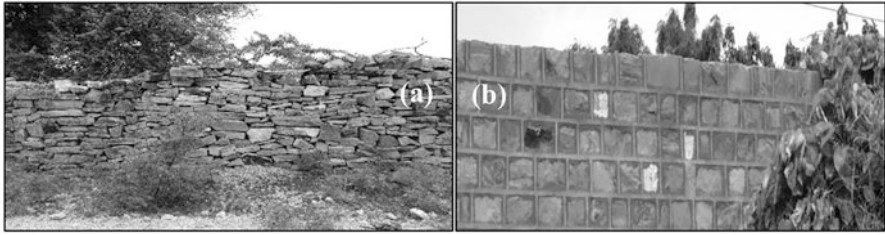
Reuse of scrap stone waste in boundary wall construction (a) with mud-water paste and (b) cement paste
